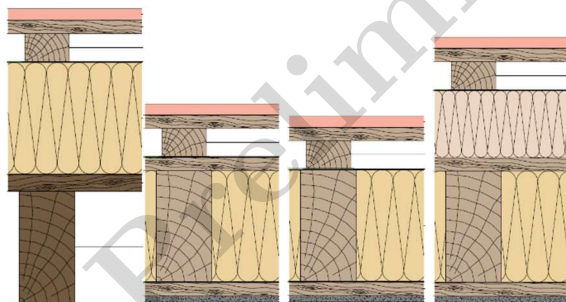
Roof assemblies investigated, from left to right: exposed-rafter roof with warm roof insulation, timber frame roofs with/without roof decking, timber frame roof with over rafter-insulation; specimen size (2.35 x 4.71) m²
